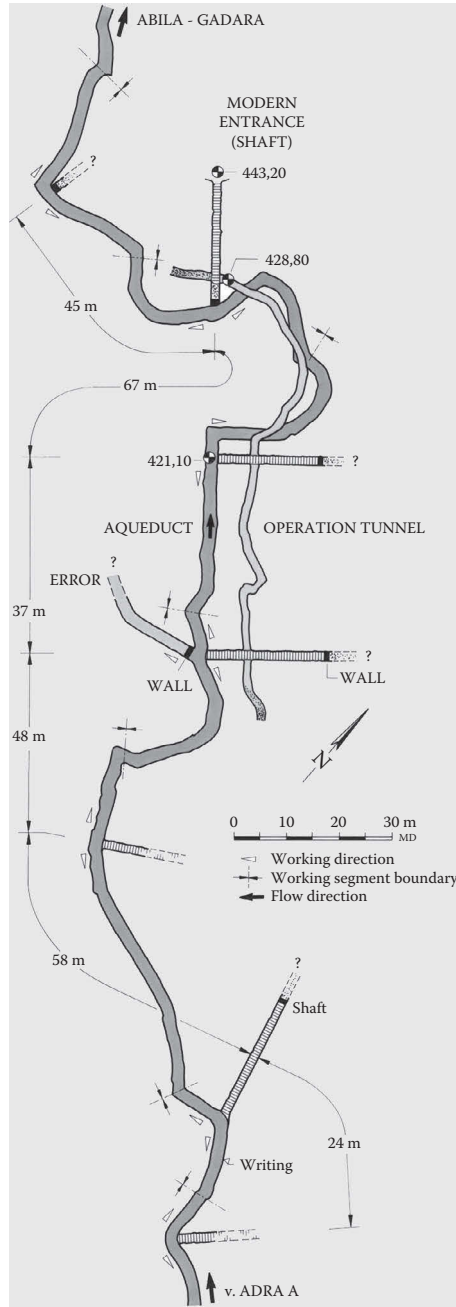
Outline of a tunnel section with construction tunnels near 'Alcāl.
